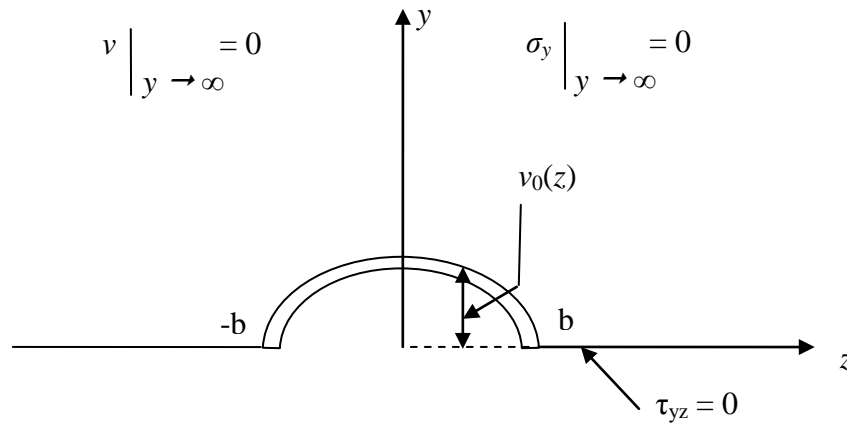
Plan View of a Wall Consisting of a Single Bay of Lagging: Soil Displacement and Boundary Conditions.
